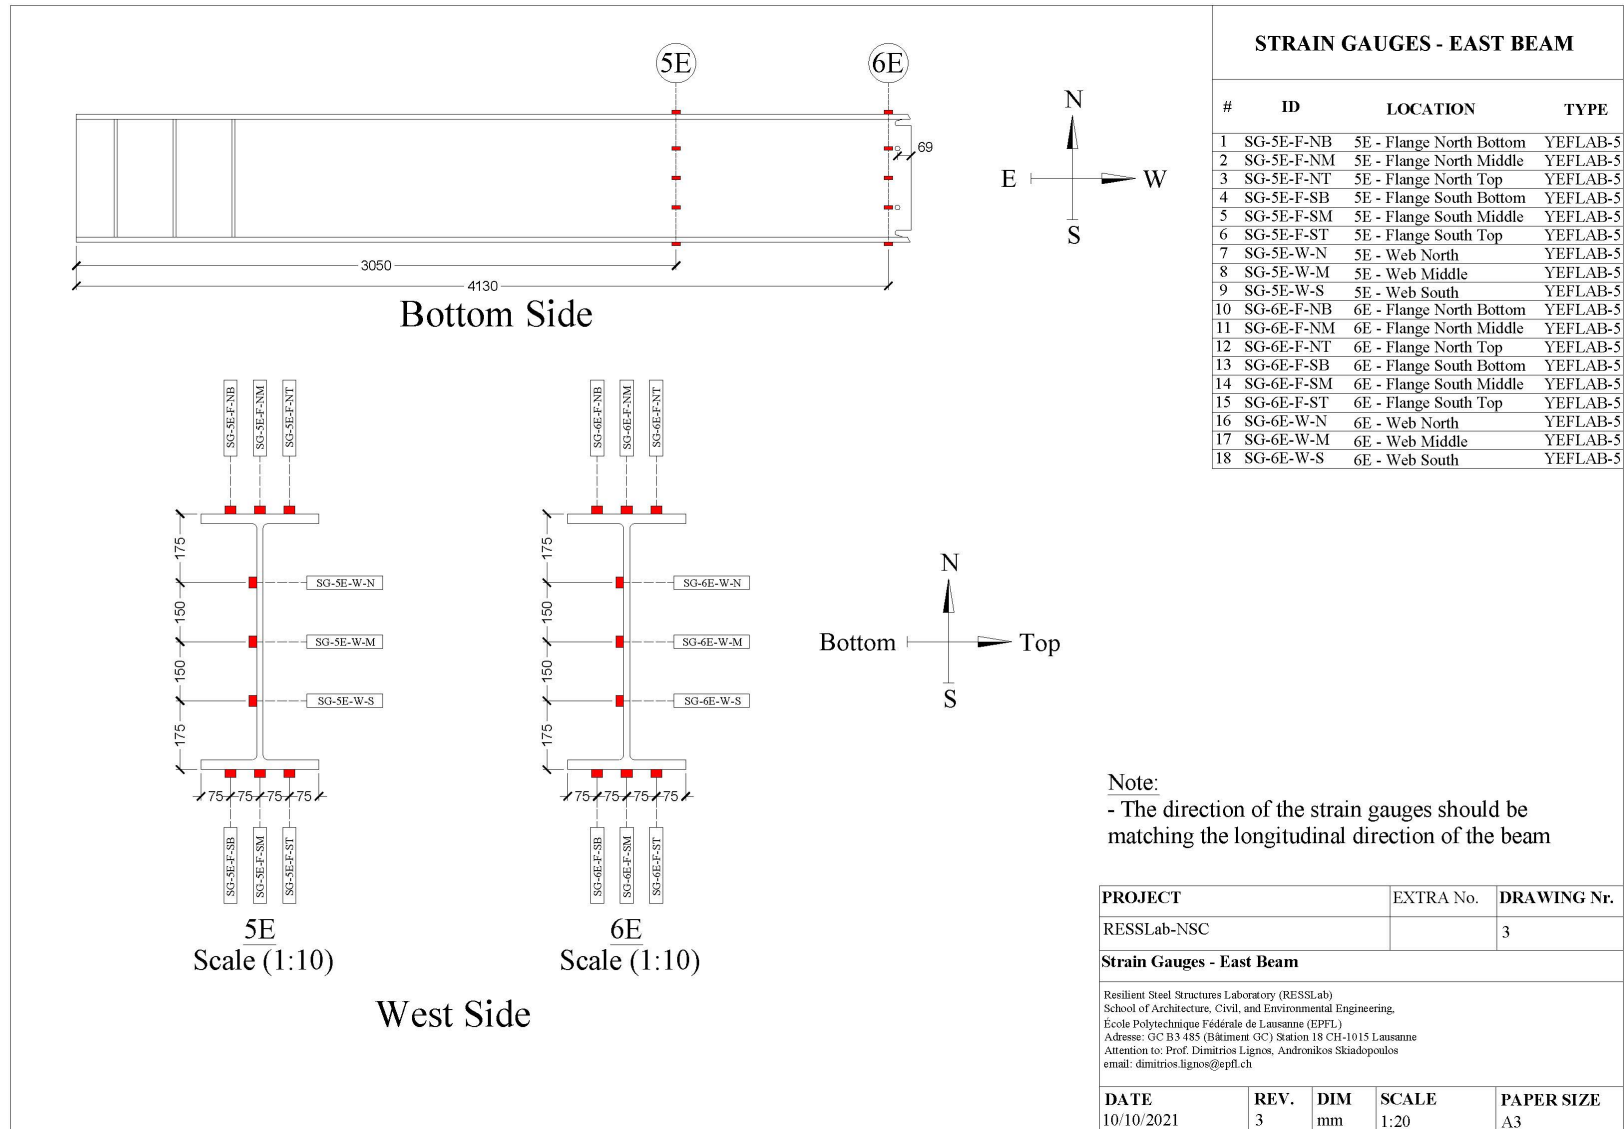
Instrumentation plan – east beam strain gauge drawings.
